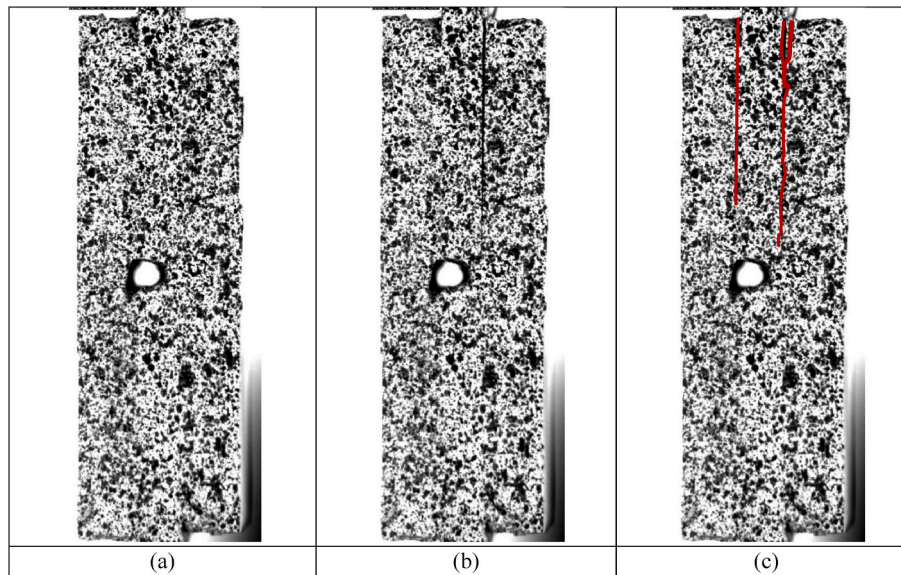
Detailed view of the failed adhesive area, test CF4#3: a) absence of cracks before failure; b-c) presence of cracks at failure.
